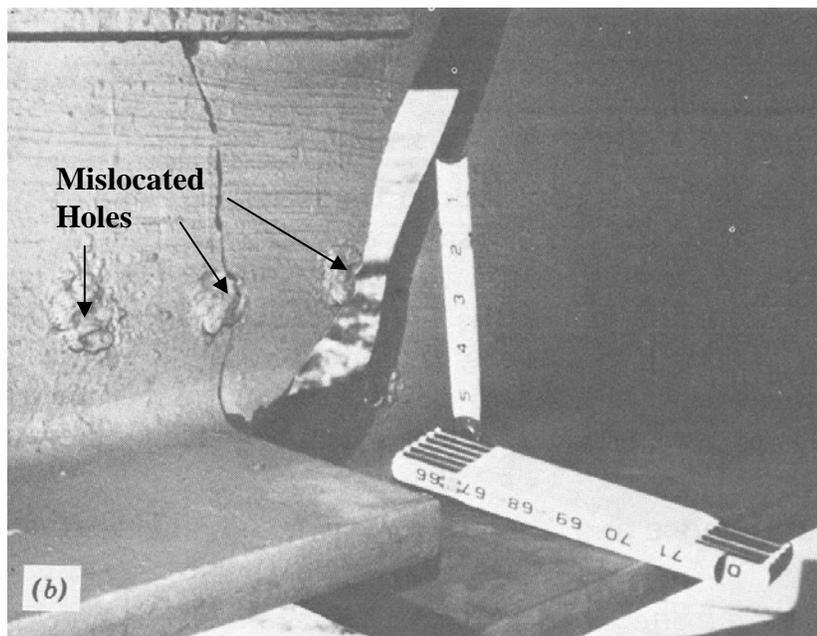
Cracking at mislocated bolt holes of Highway 28 Bridge over I-57 (Fisher 1984)
